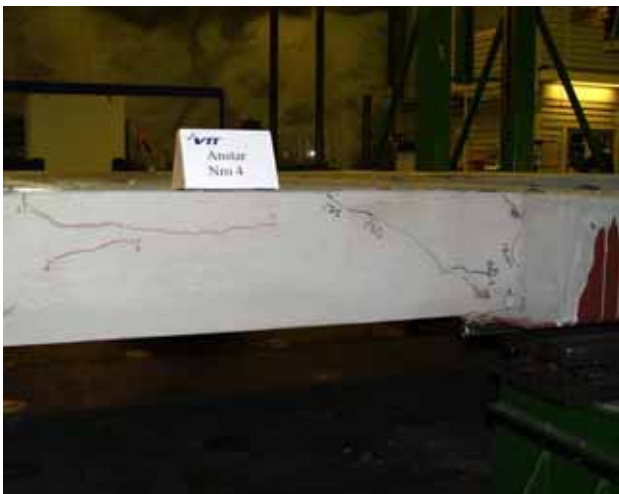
Cracks in slab 4 after failure. The red colour and letter A refer to an initial crack.
